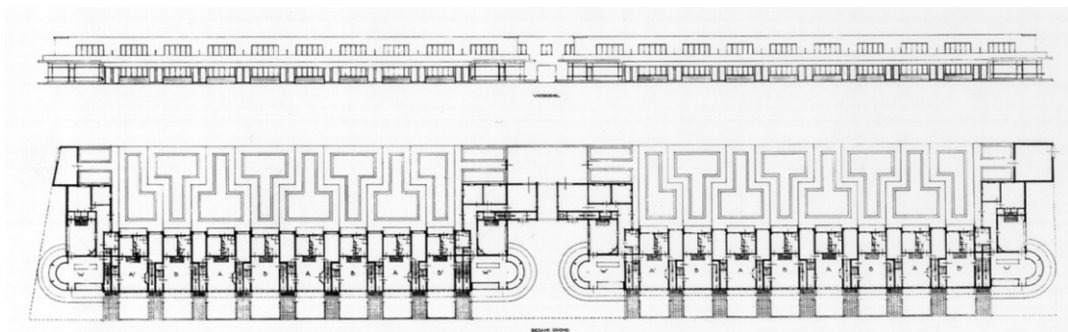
Row Houses, Hoek van Holland, 1924, facade and block layout
